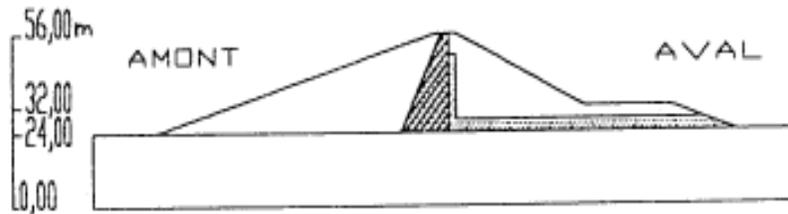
Cross-section of El Houareb dam, Elevation is in meters
